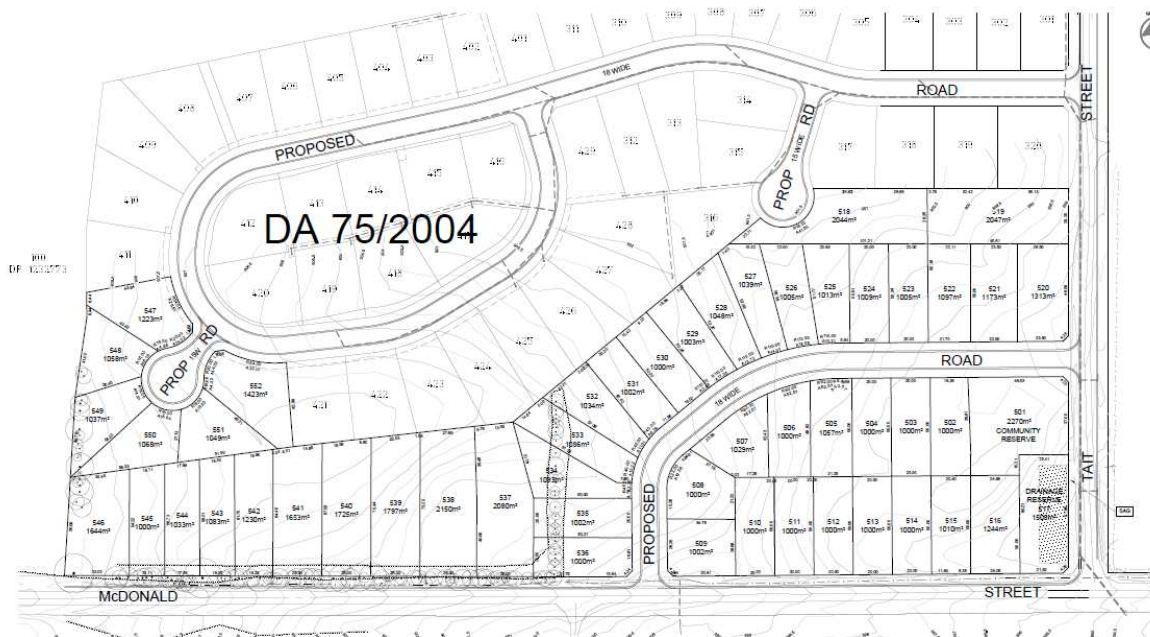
Plan of Proposed Subdivision (Source: CDS drawing ref: 2124 DA03 Iss C)
